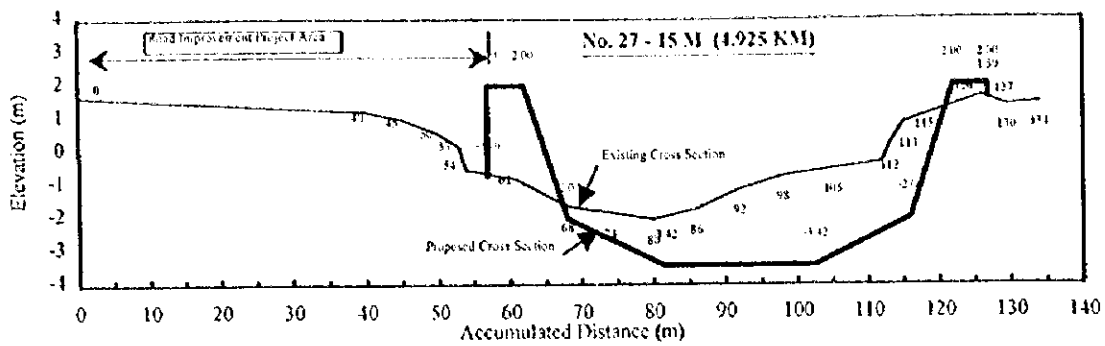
(2/2) Typical Design Cross Section of Tau Hu – Ben Nghe Canal Improvement
